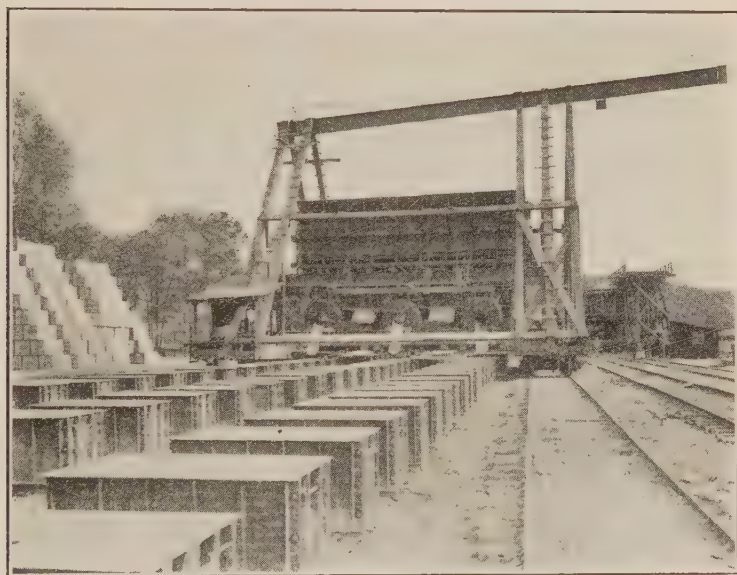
TRAVELING MIXING PLATFORM, STEEL FORMS, MATERIAL BINS AND STORAGE PILE OF THE CONCRETE BLOCK PLANT.
